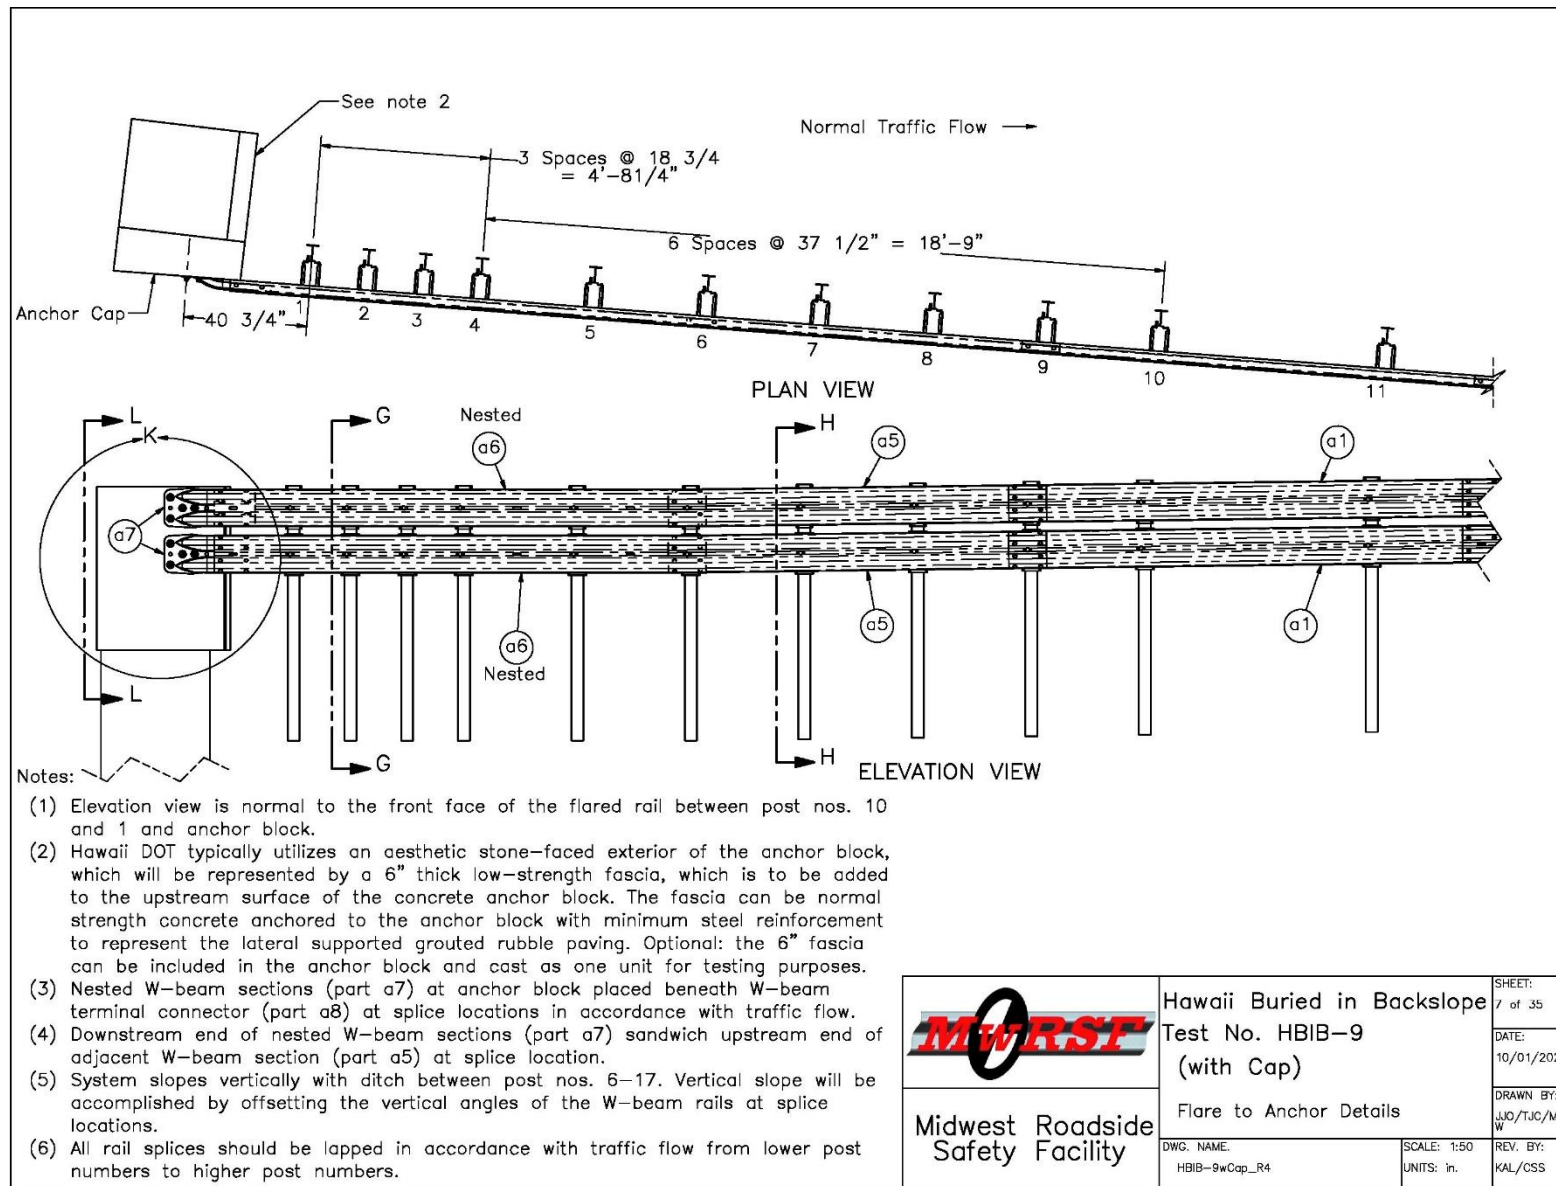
Flare to Anchor Details, Test No. HBIB-9
